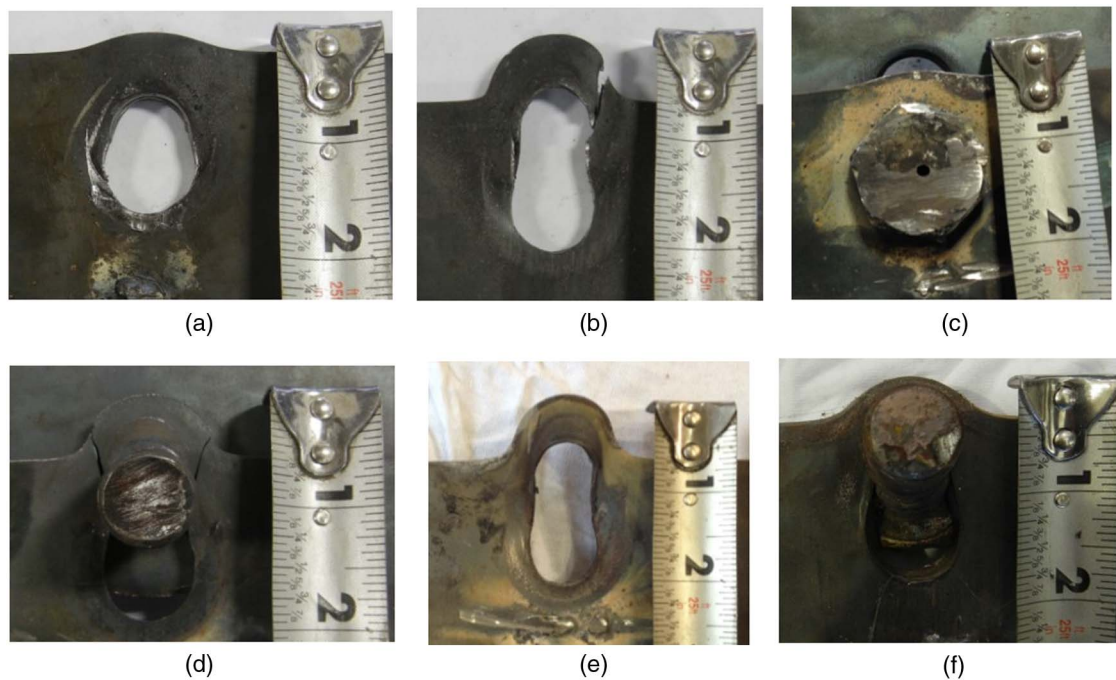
Lap-splice joints after testing for plate bearing failure mode: (a) Specimen PB-1, Plate 1; (b) Specimen PB-1, Plate 2; (c) Specimen PB-2, Plate 1; (d) Specimen PB-2, Plate 2; (e) Specimen PB-3, Plate 1; (f) Specimen PB-3, Plate 2
